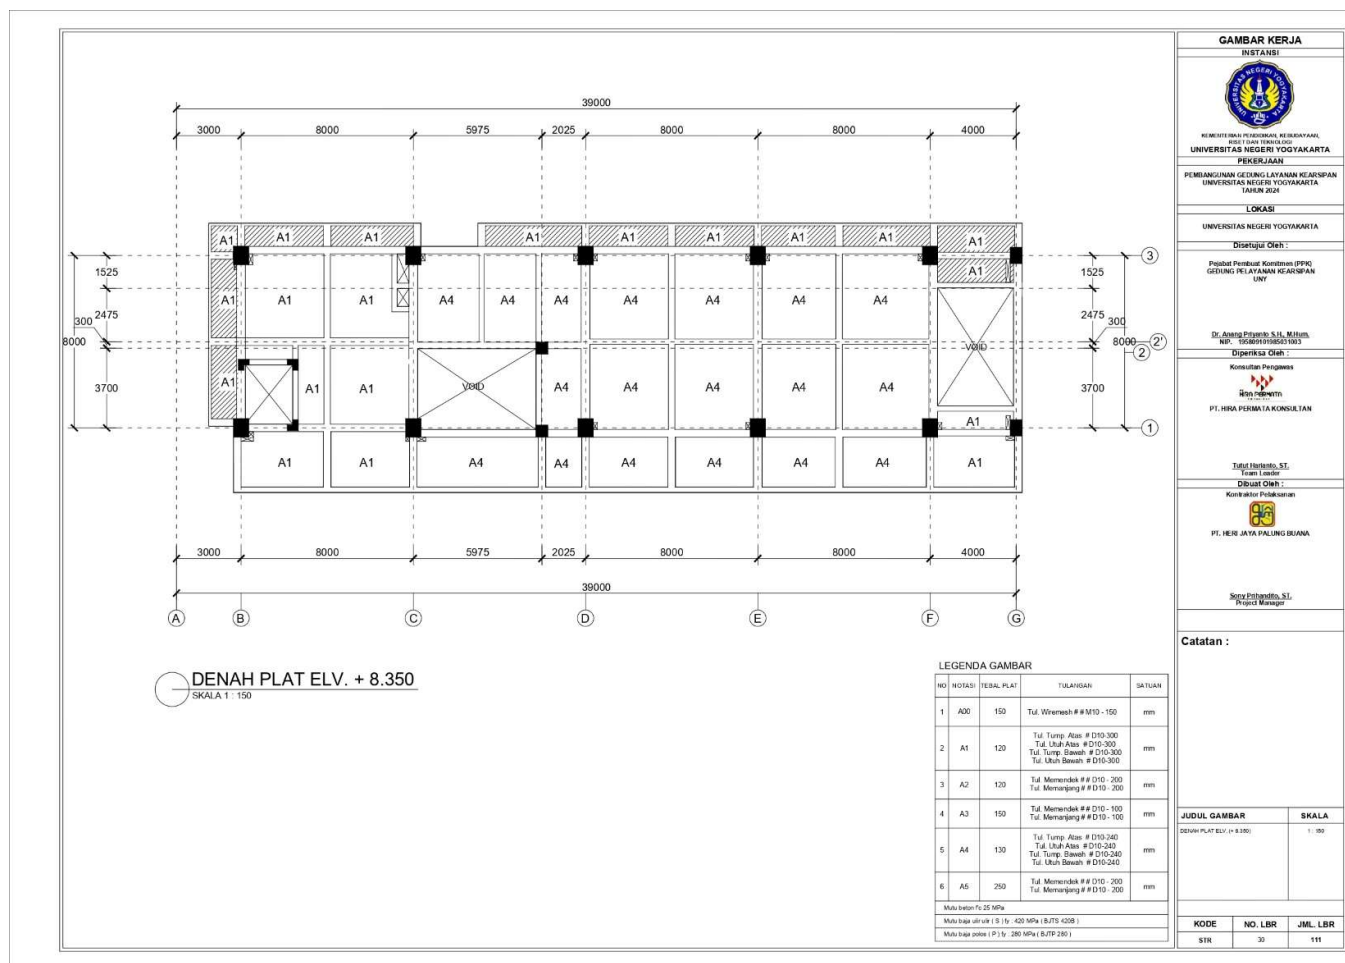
12 Slab Site Plan of Elv. +8.350
